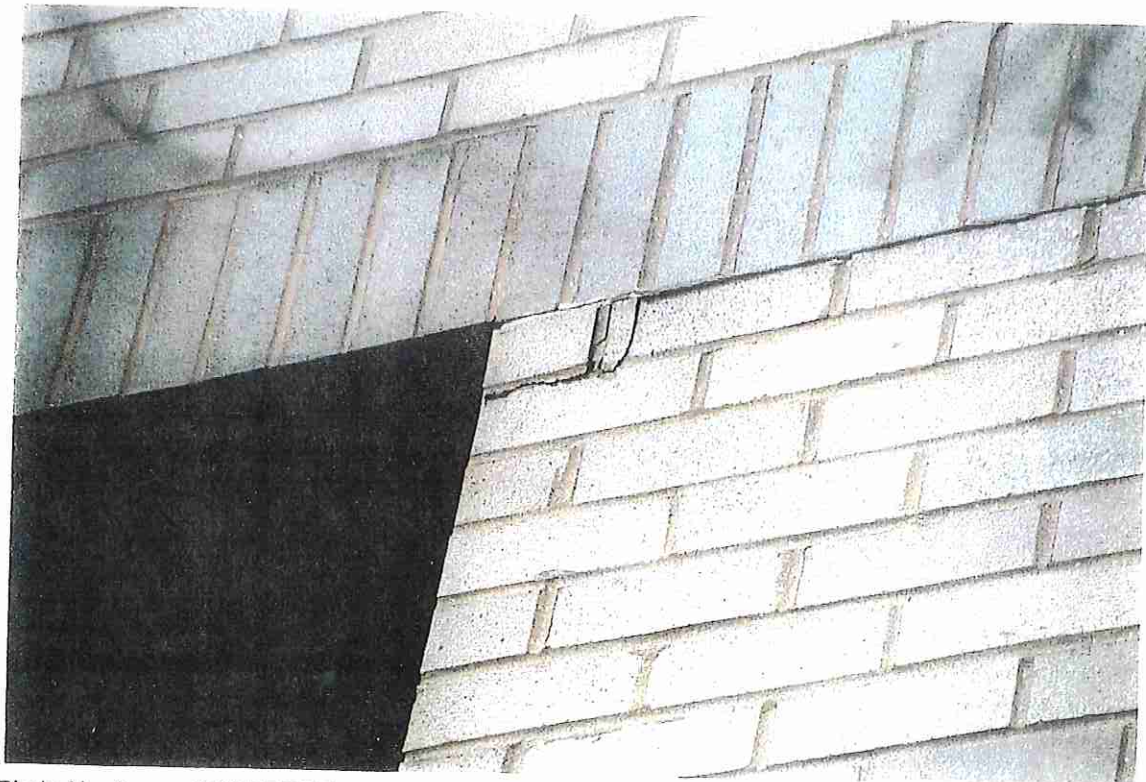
COMPRESSION CRACK AT LINTEL BEARING DUE TO LACK OF PROPER SOFT
